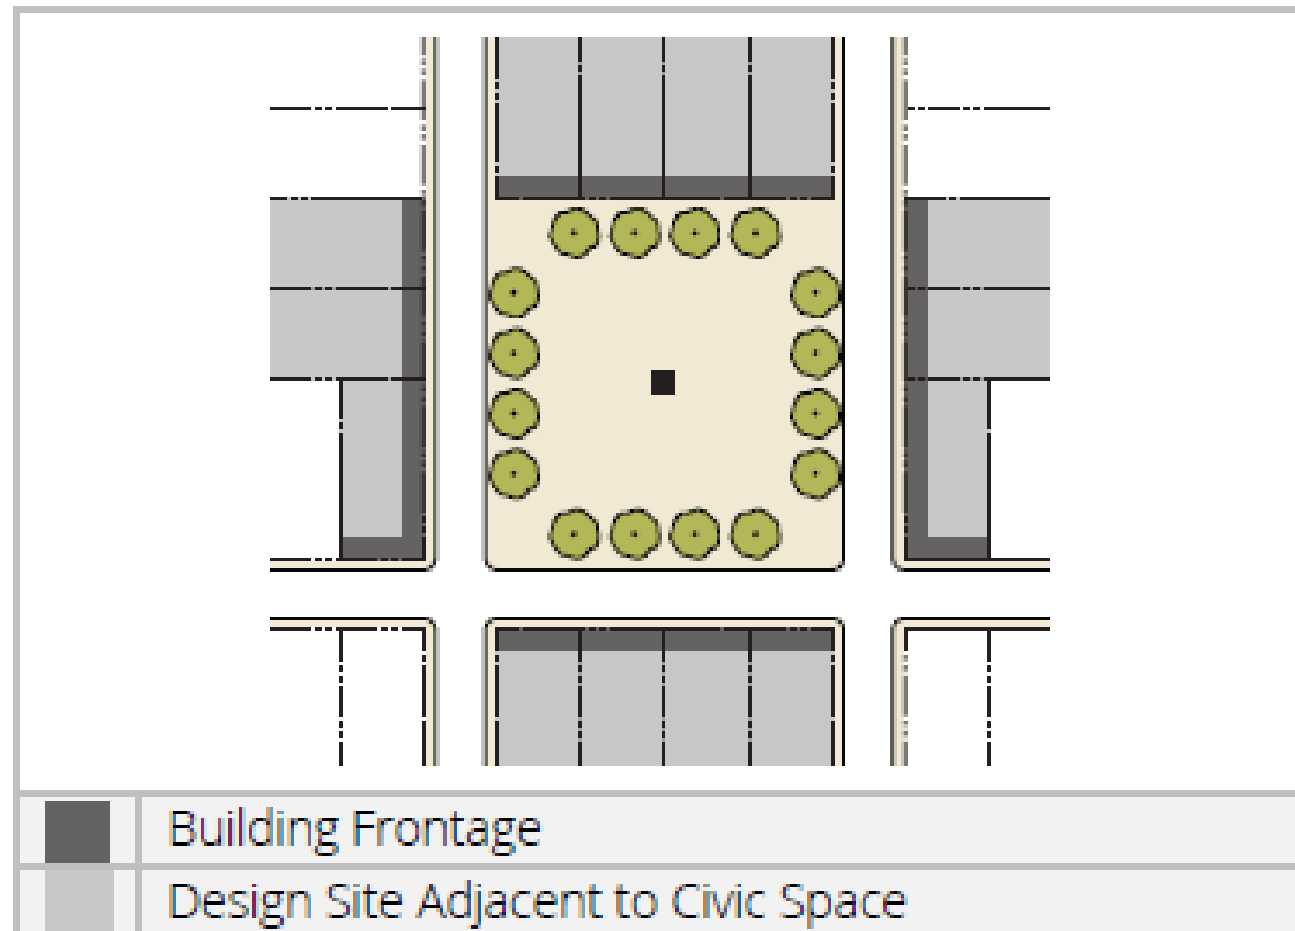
Building Frontage Adjacent to a Civic Space
